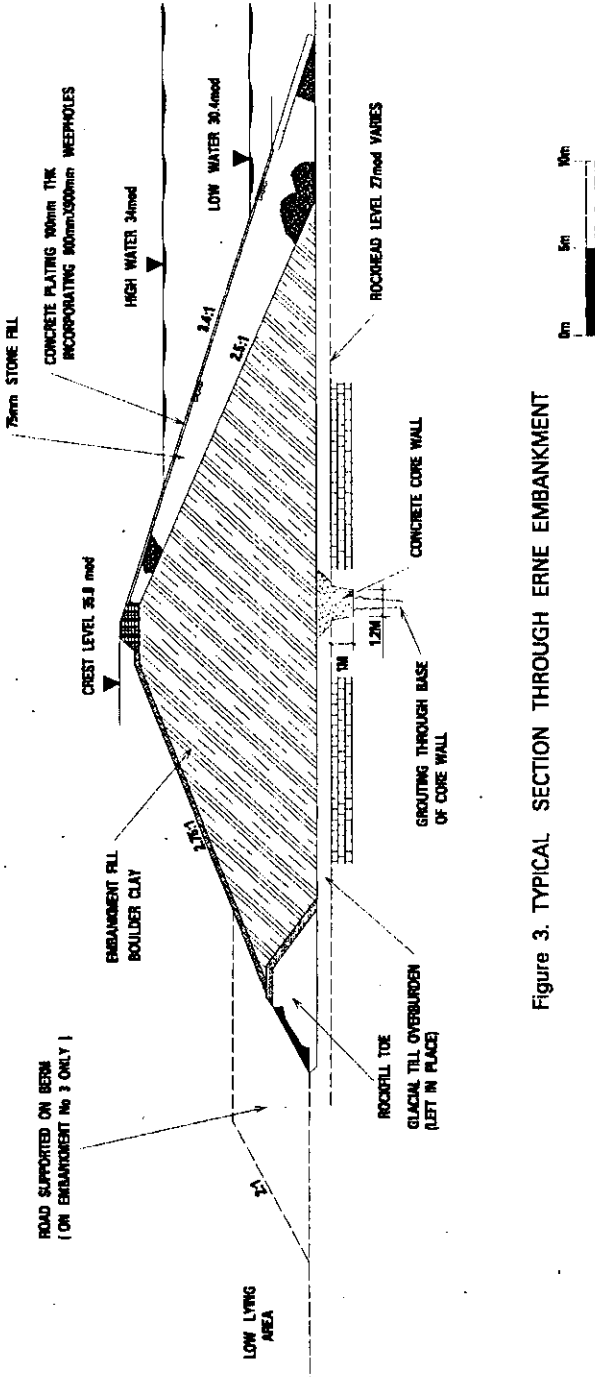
TYPICAL SECTION THROUGH ERNE EMBANKMENT
